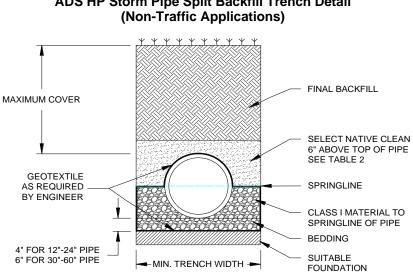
ADS HP Storm Pipe Split Backfill Trench Detail (Non-Traffic Applications)
